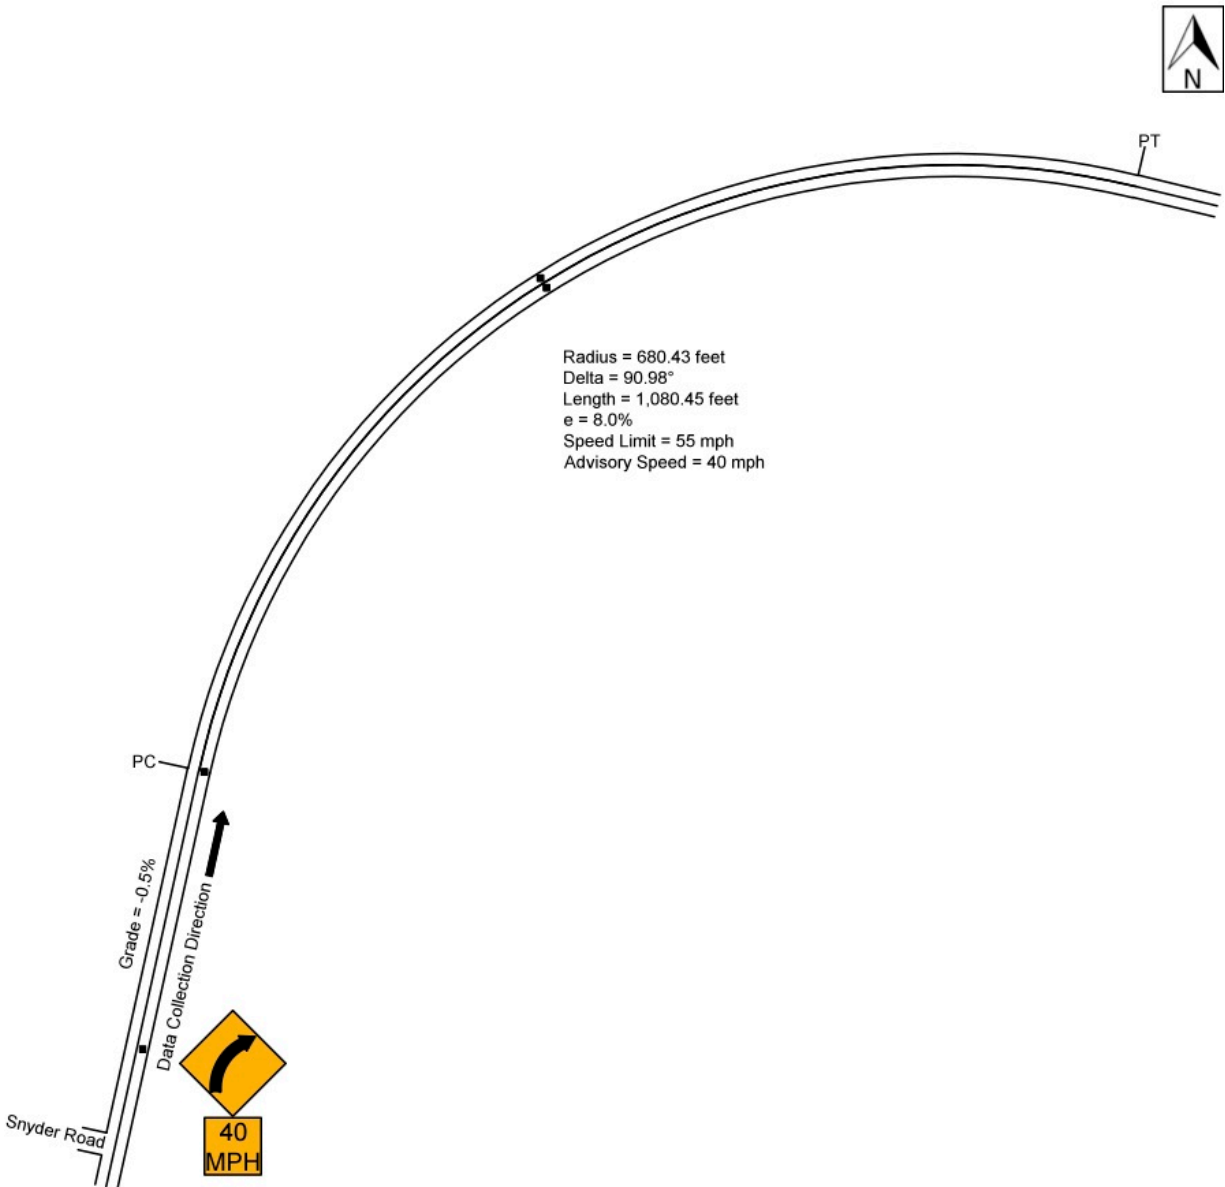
Diagram. Geometric layout of WV Route 32 treatment site (not to scale).
